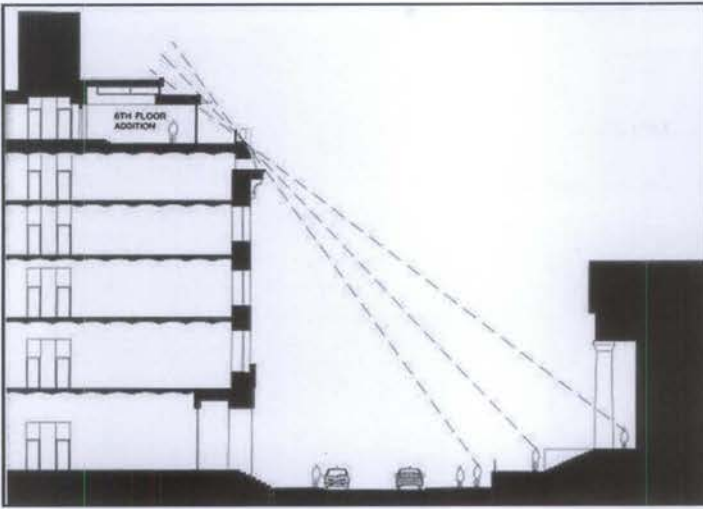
How to Evaluate a Proposed Rooftop Addition.
